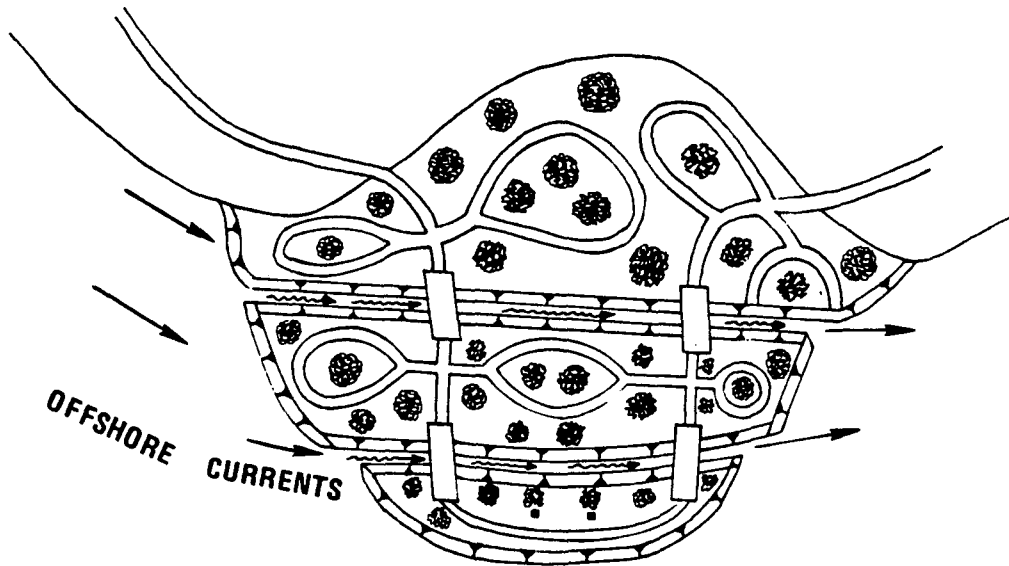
Fill For Small Park With Open Channels Provided For Water Movement. Retaining Dikes and Channel Banks Should Be Protected With Rip-Rap
